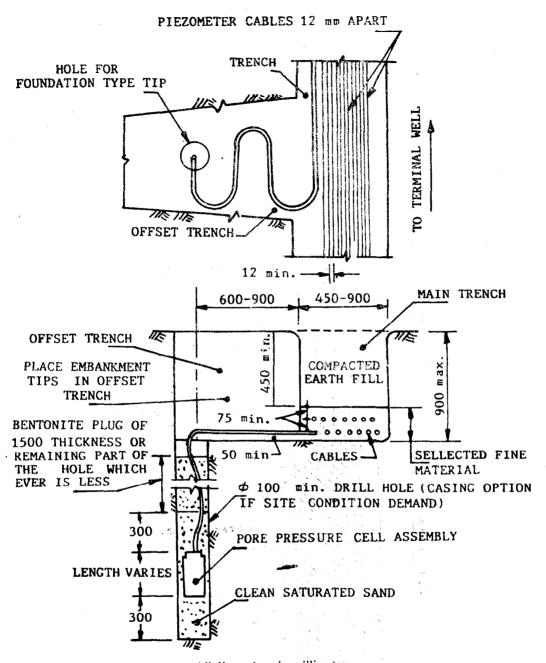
PORE PRESSURE CELL ASSEMBLY FOR INSTALLATION IN DRILL HOLES
